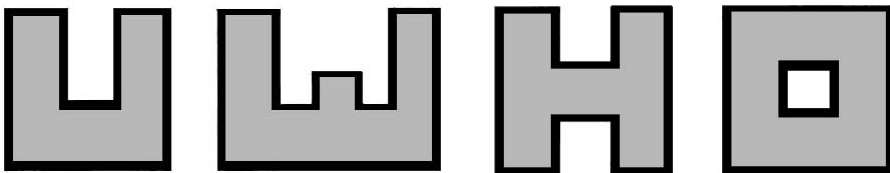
Common floor plans for larger buildings prior to the twentieth century (because of the need for natural light and ventilation).
